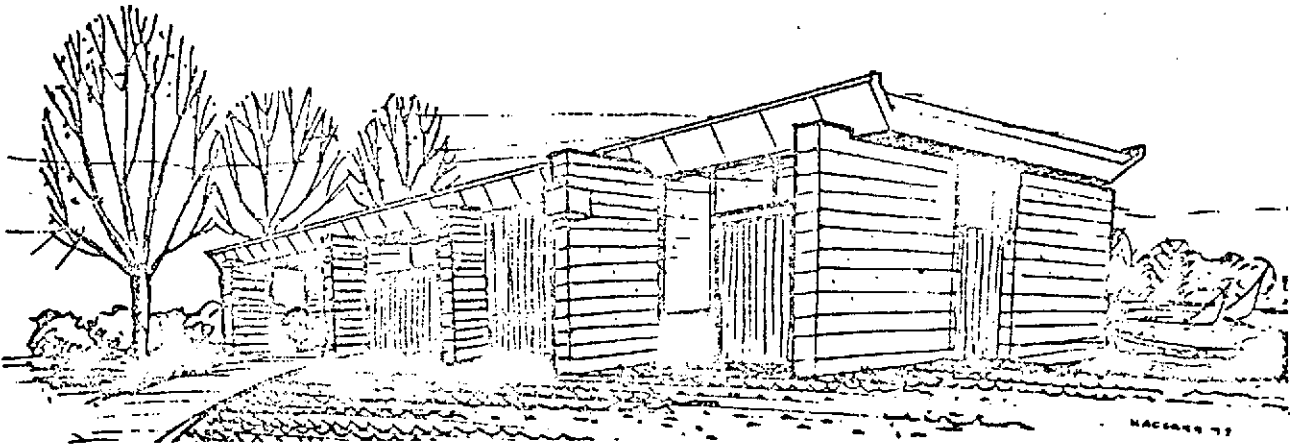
Solar Heated House with Roof Pond.⁴⁷
